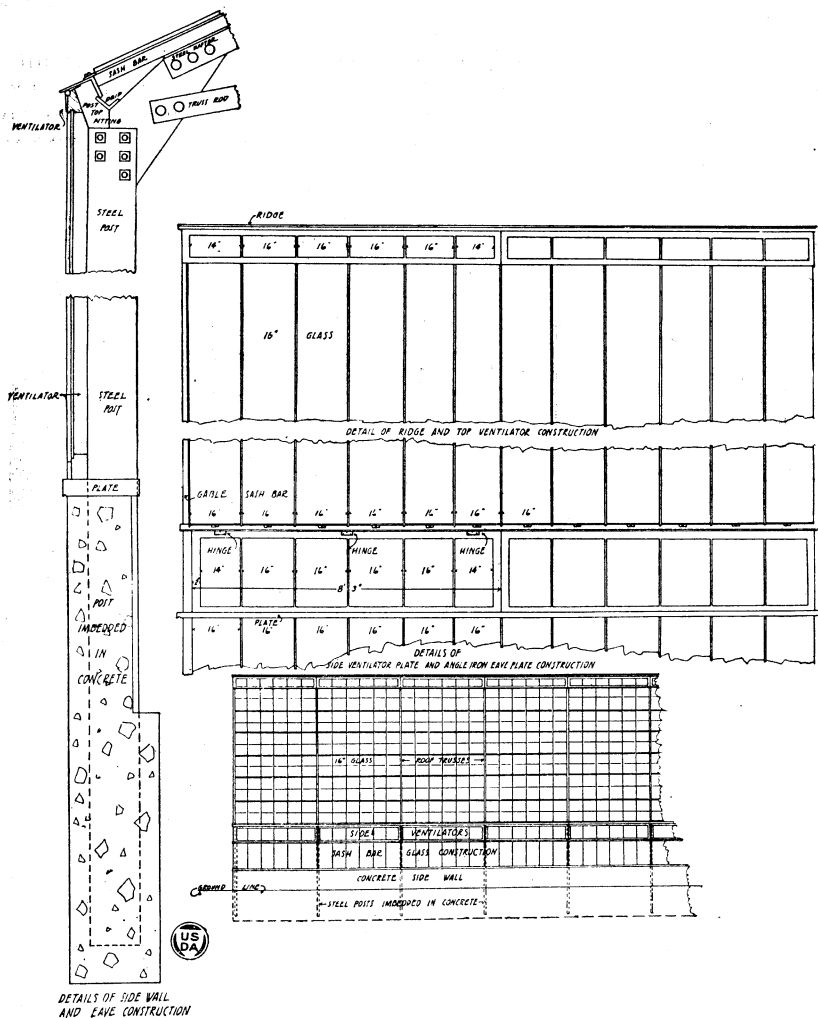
Details of construction of the steel-frame house shown in Figure 19.
